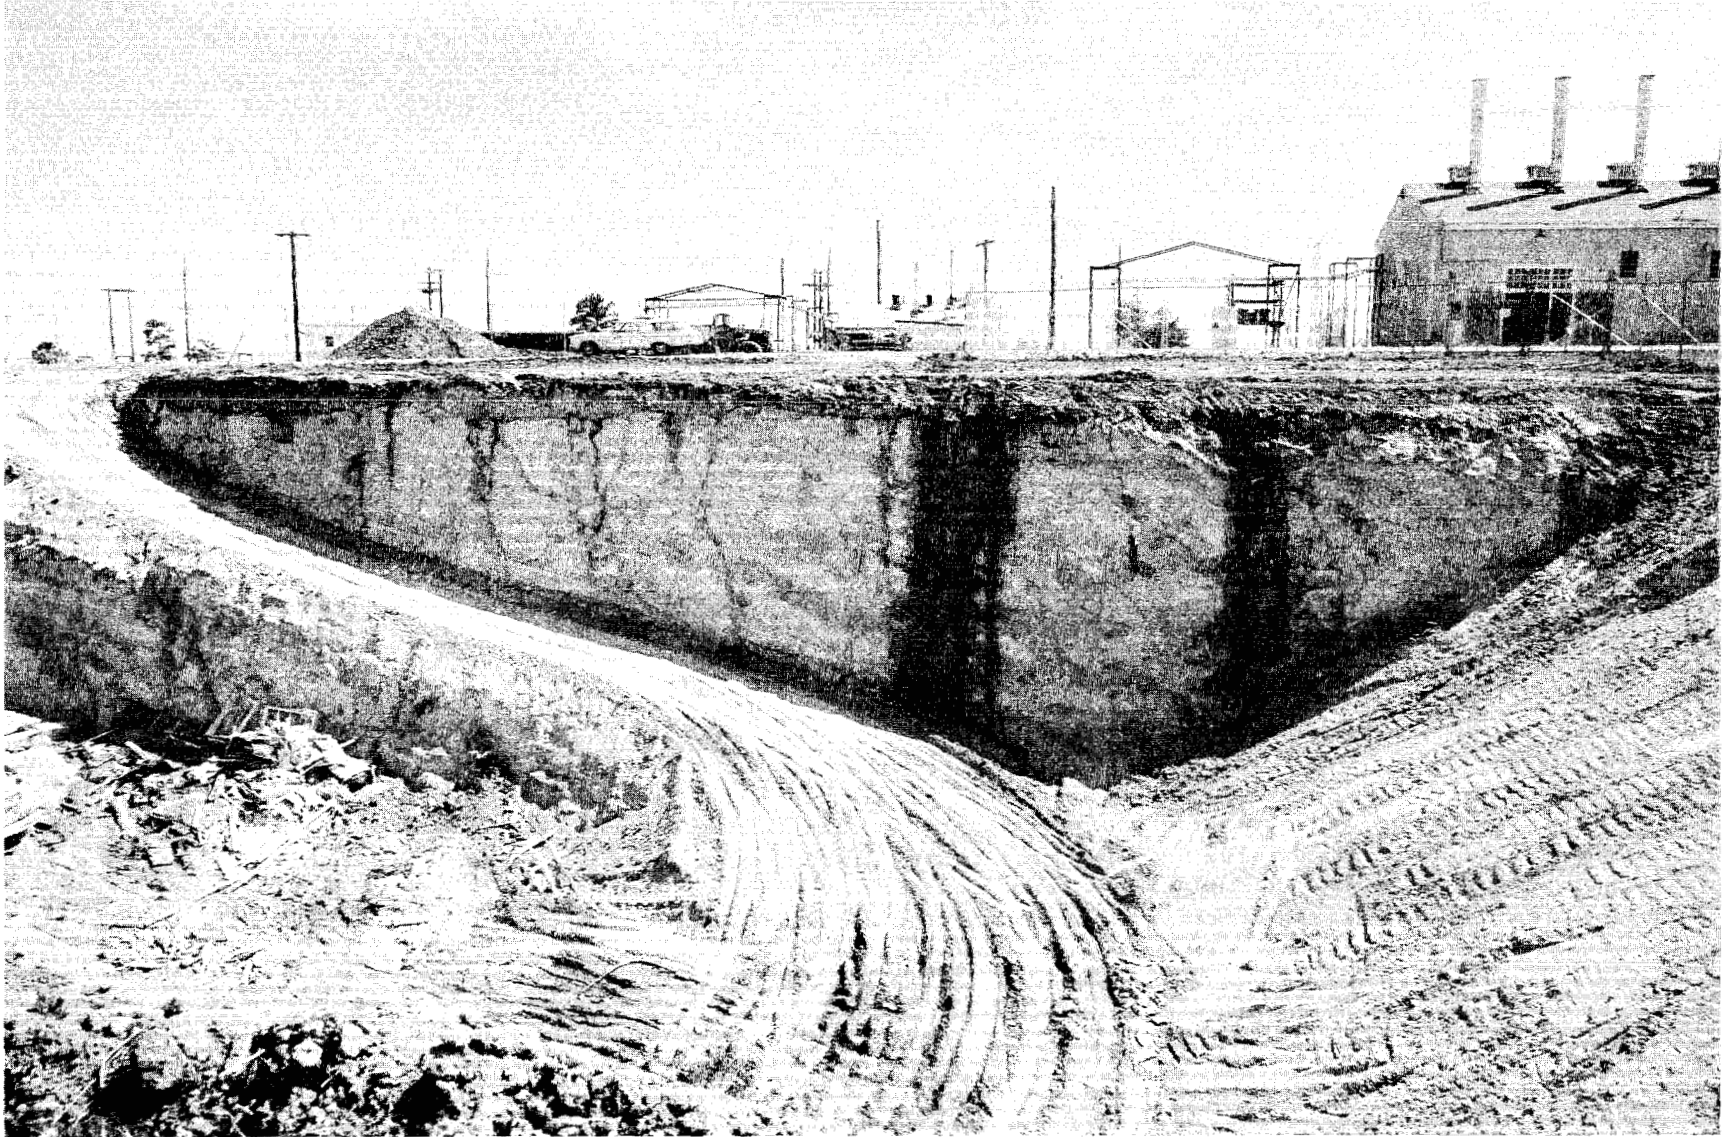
Photograph (1969) of the southern wall of the central disposal pit.
